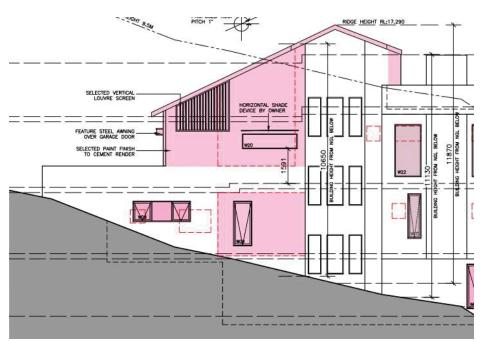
Western elevation refer to as Elevation 2 Sheet 9
